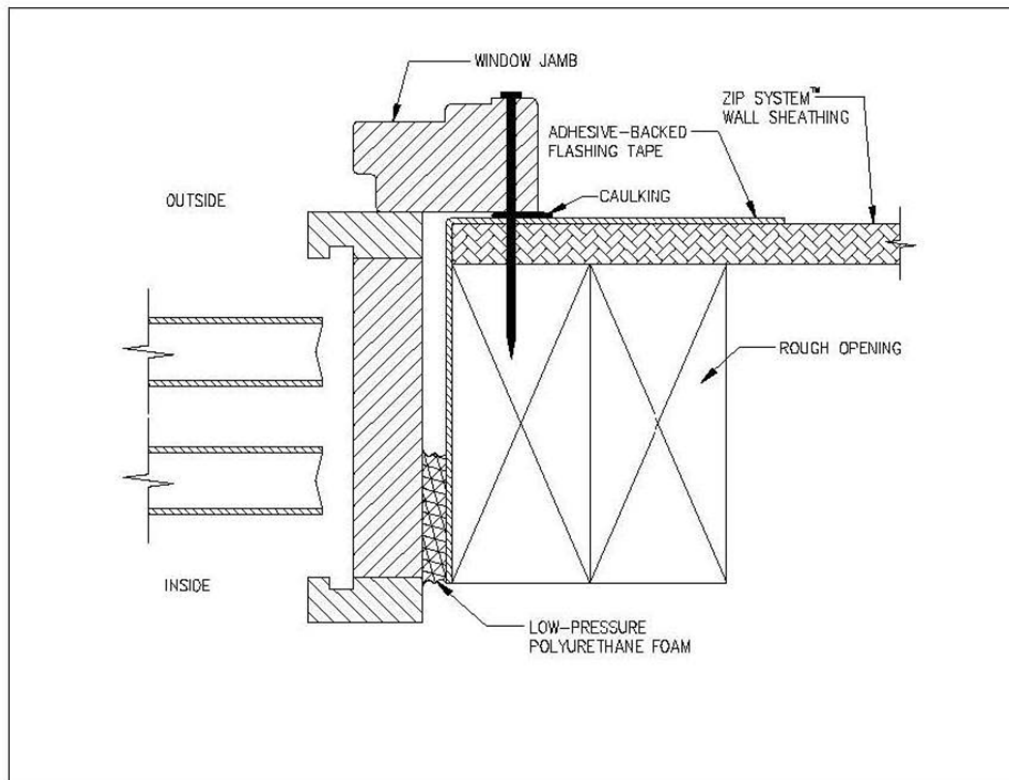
TYPICAL CROSS SECTIONS OF FLANGED WINDOW
